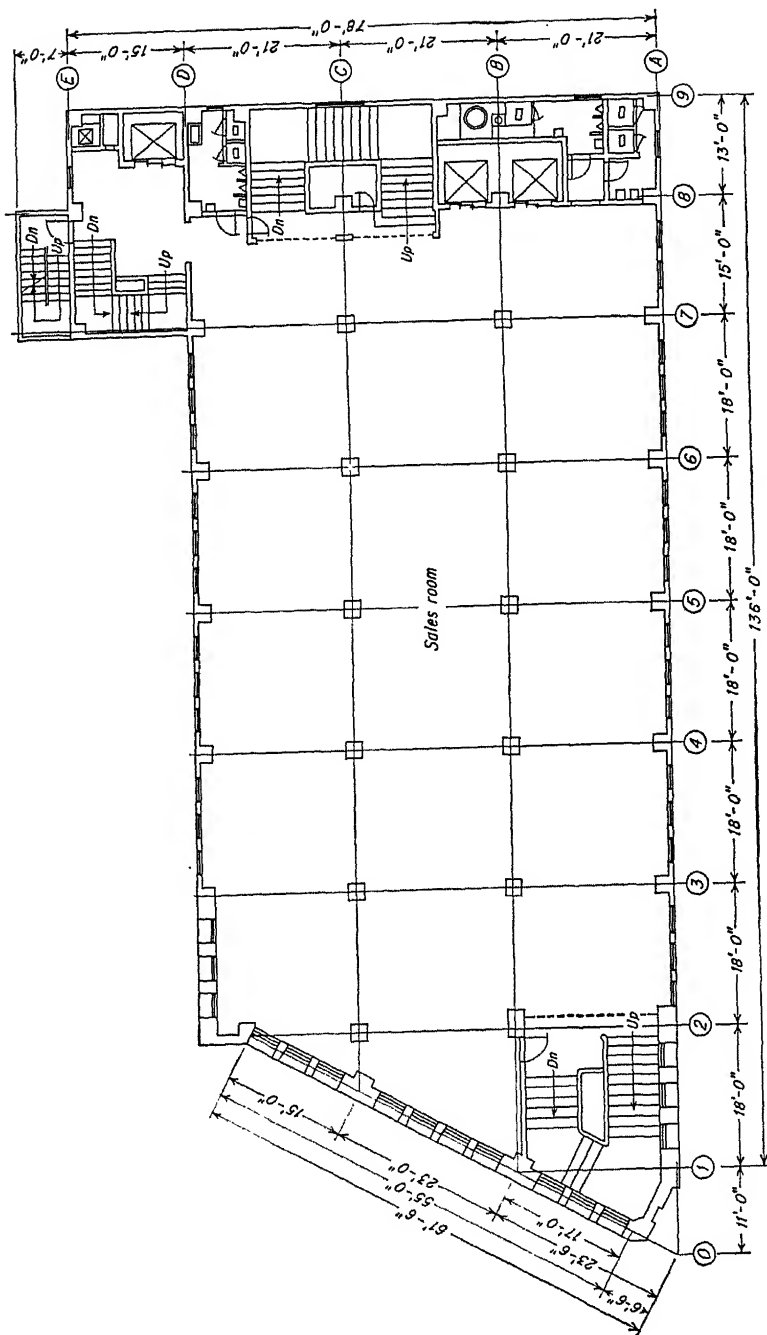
Typical (second-, third-, fourth-) floor plan.
